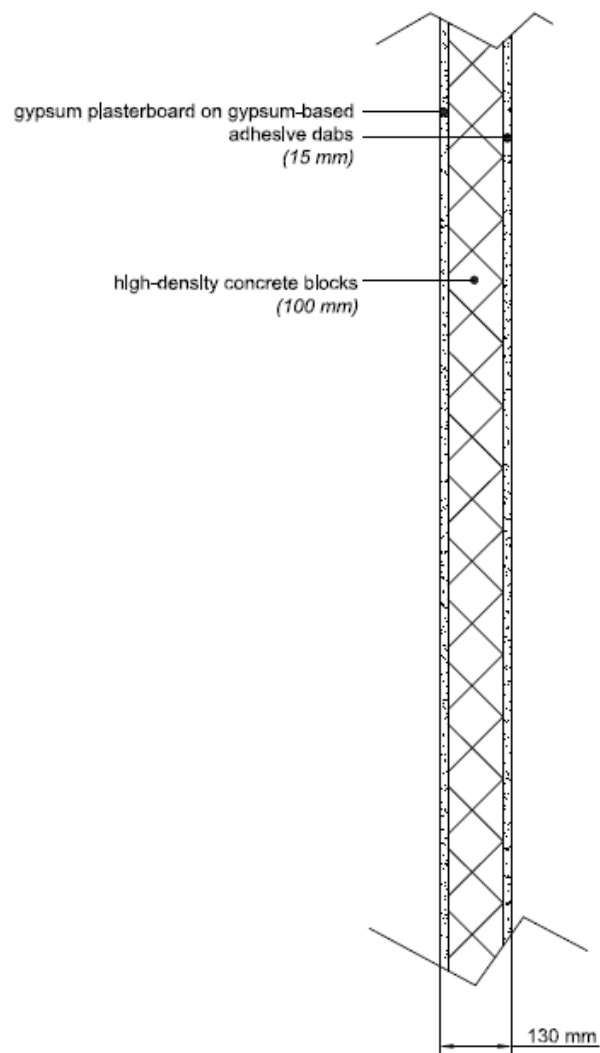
Partition wall F (load-bearing masonry), horizontal section.
